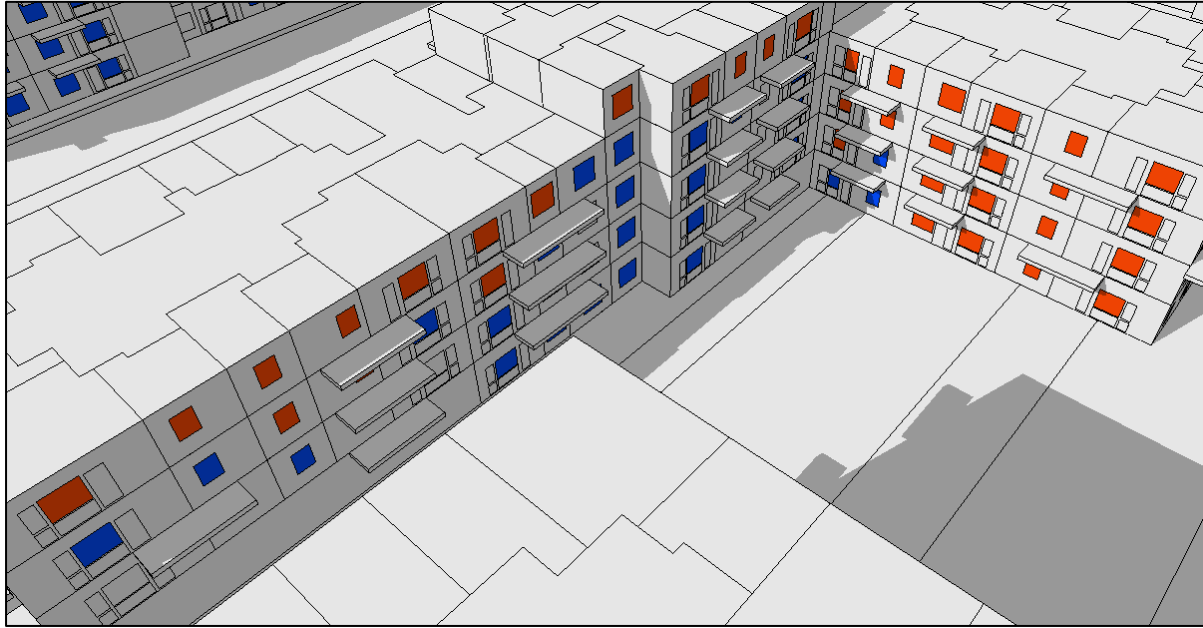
Windows achieving 1.5 hours of sunlight - East elevation of Building 09 (modelling software)
